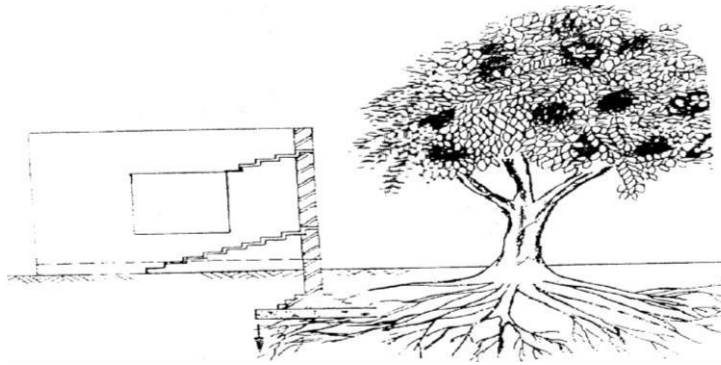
Cracks in the walls due to shrinkage of soil (Narrow at base and wideupward)
